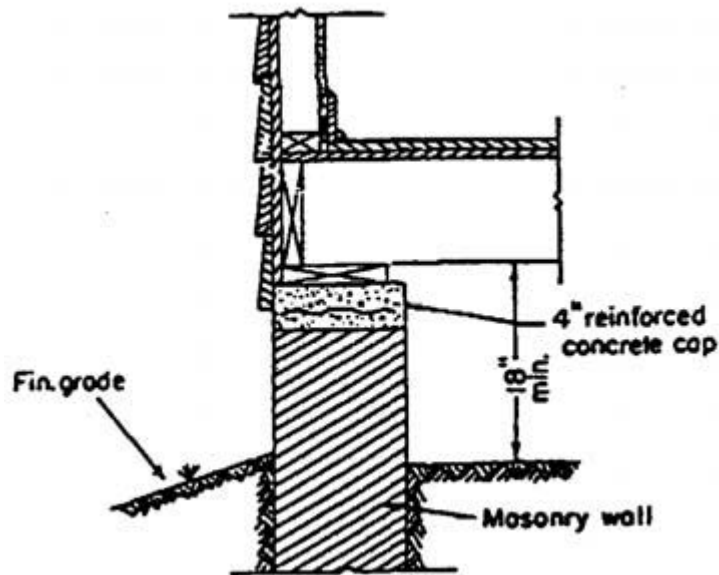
A reinforced poured concrete cap on masonry walls or pier
